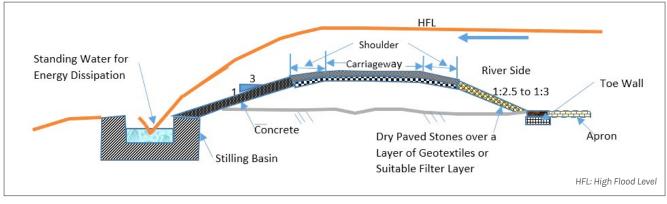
Cross section of road that is overtopped by flood water, with erosion protection
